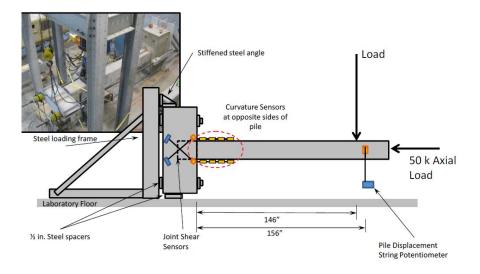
Pile cap beam connection model tested at the University of South Carolina
